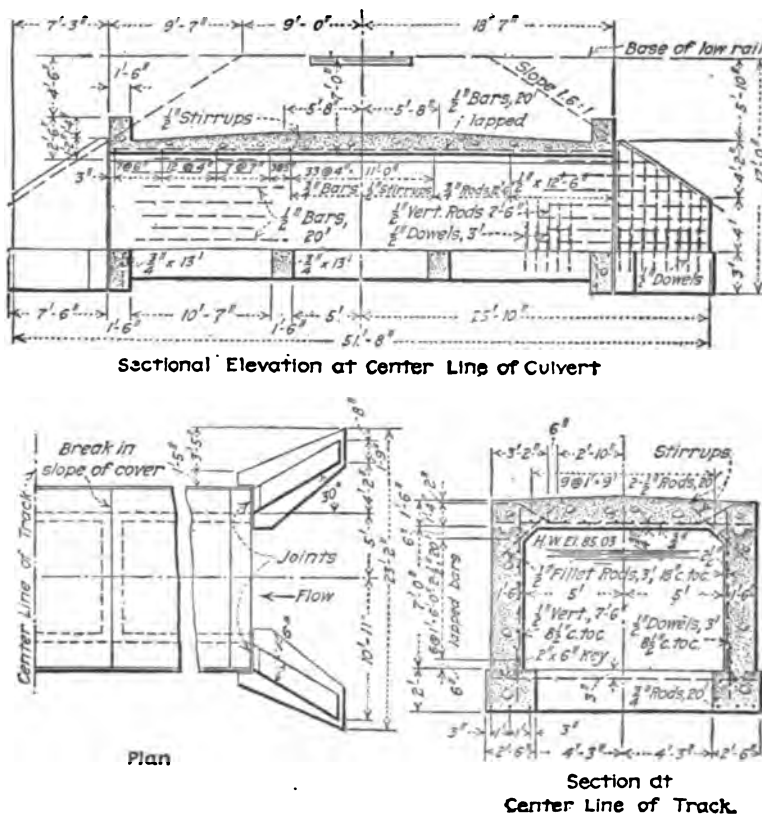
Single box culvert, C. M. & St. P. Ry.
